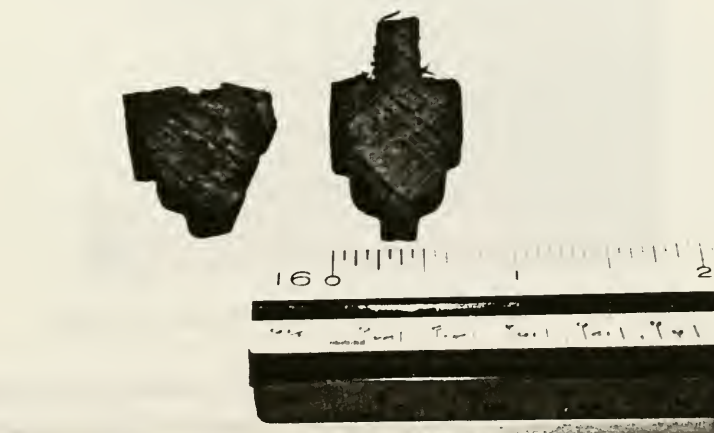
Federal Section Muntins; Cross Hall Transom and East Parlor
